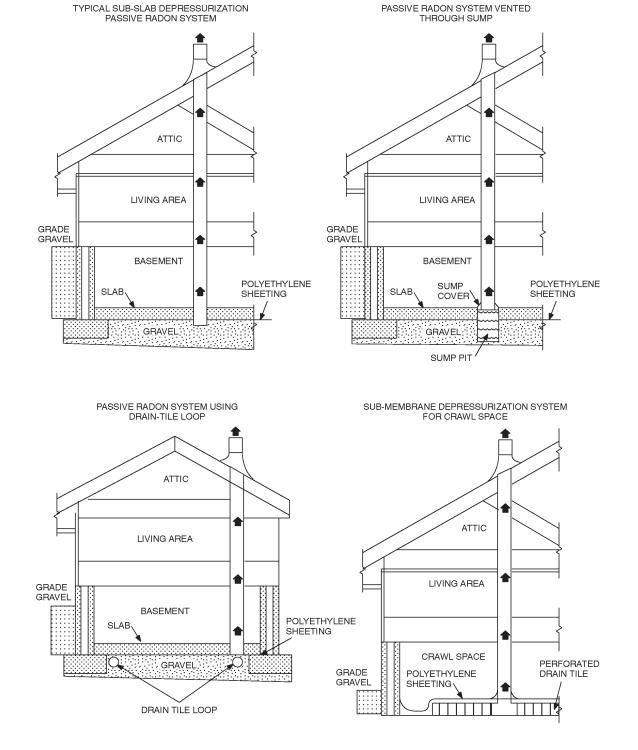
RADON-RESISTANT CONSTRUCTION DETAILS FOR FOUR FOUNDATION TYPES
